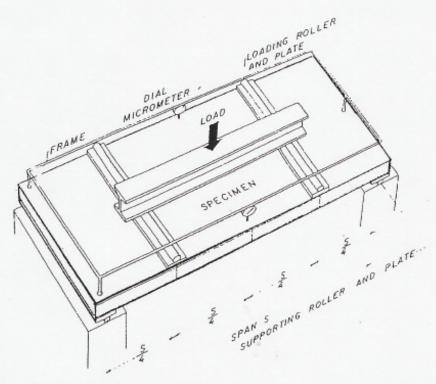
Test Setup for Transverse (Flexural) Loading (from "ASTM E72-98, Fig. 3")
